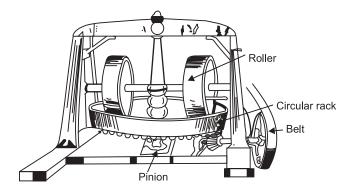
Power Driven Mortor Mill (Pan Mill)
